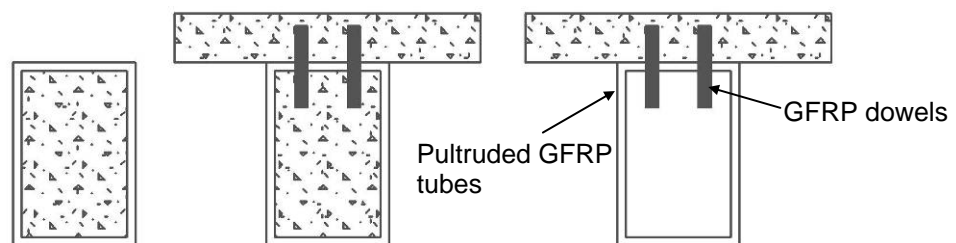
Concrete-filled FRP tubes with a concrete slab on top (Fam and Skutezky, 2006)
